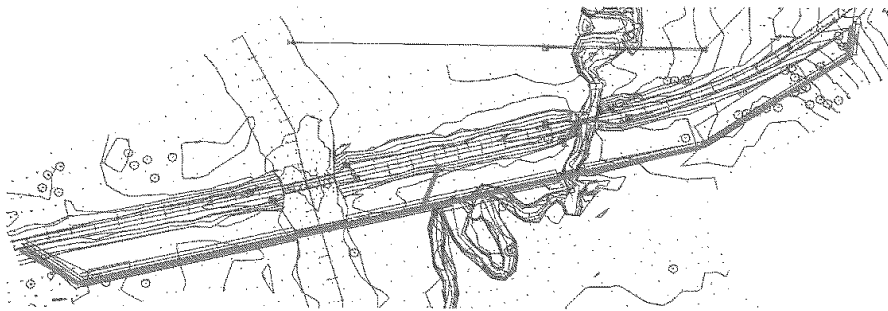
Plan of Detour Road of Muera I and Muera II Bridge
